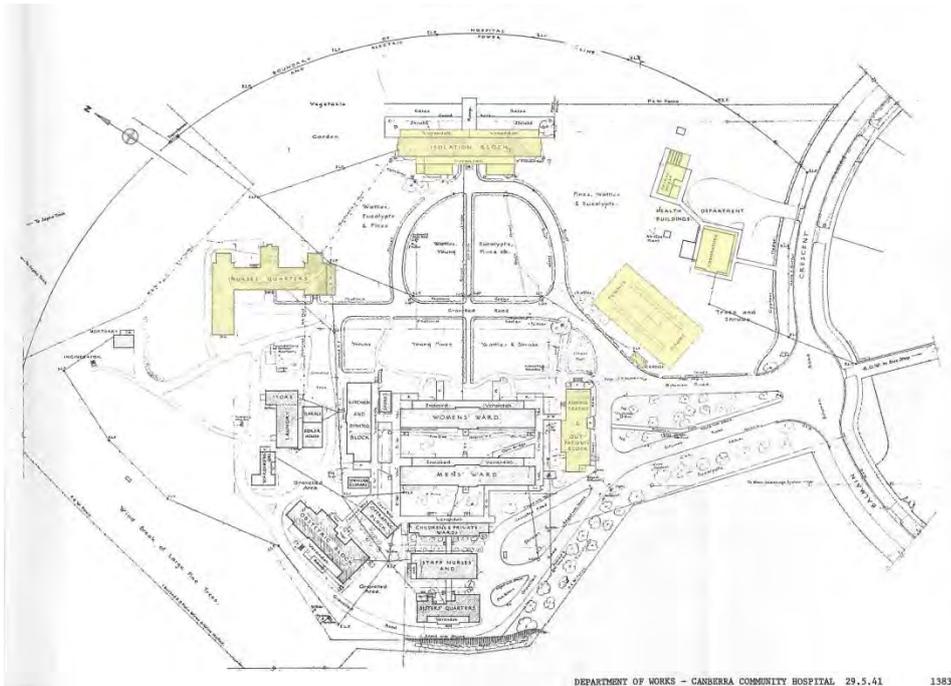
1941 plan of the Old Hospital Building area. The shaded buildings represent extant buildings that have not been demolished. (Source: ANU Archives)
